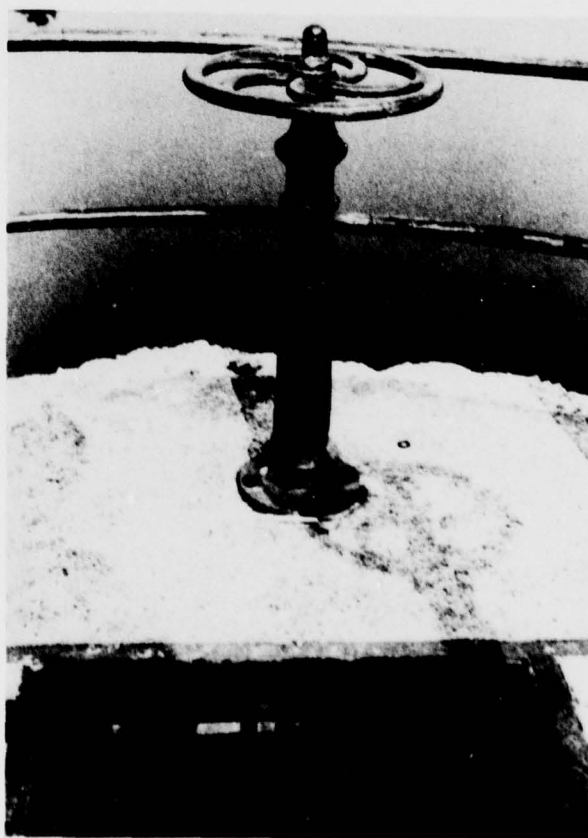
INTAKE BOX ENTRANCE AND GATE STEM AT INTAKE
